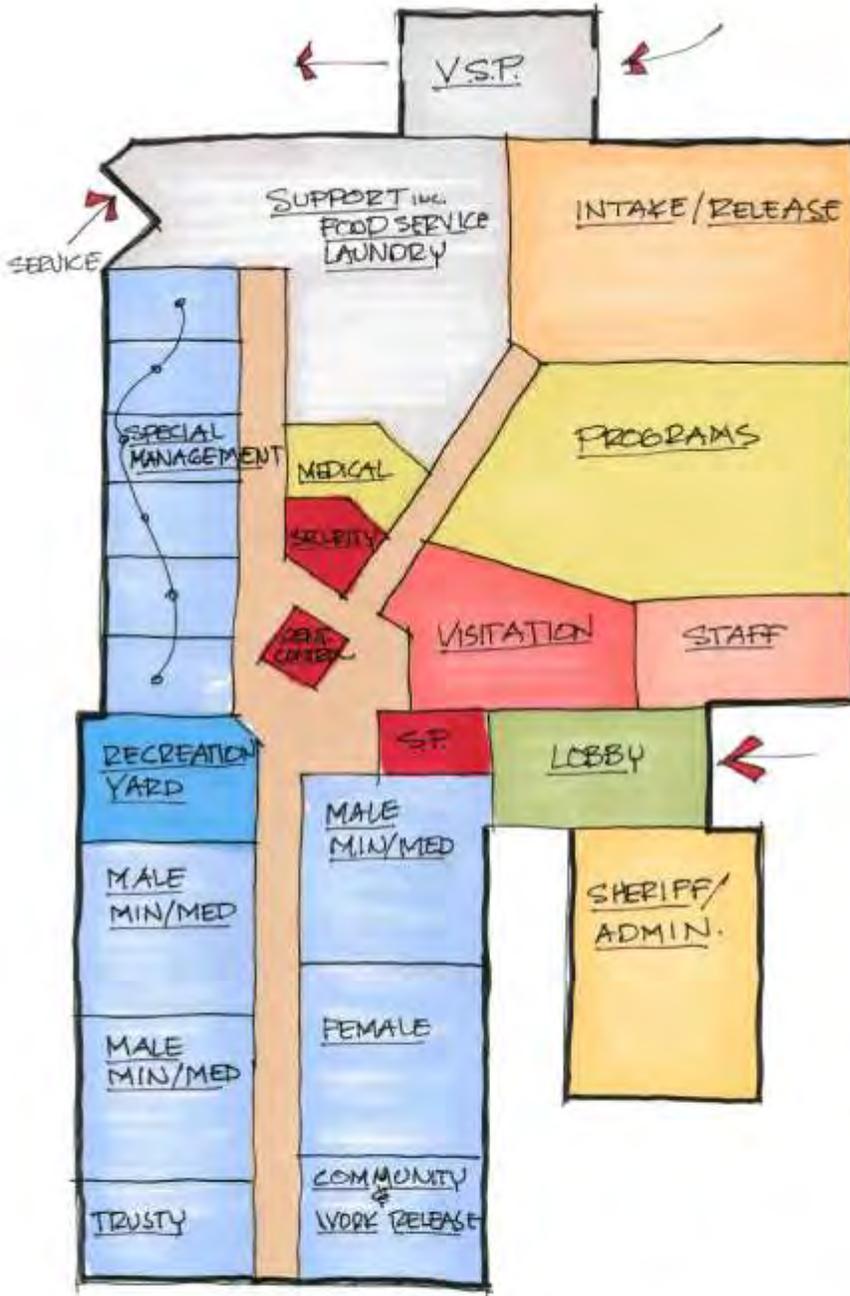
Existing Jail Re-Use Plan, Concept Plan 4
